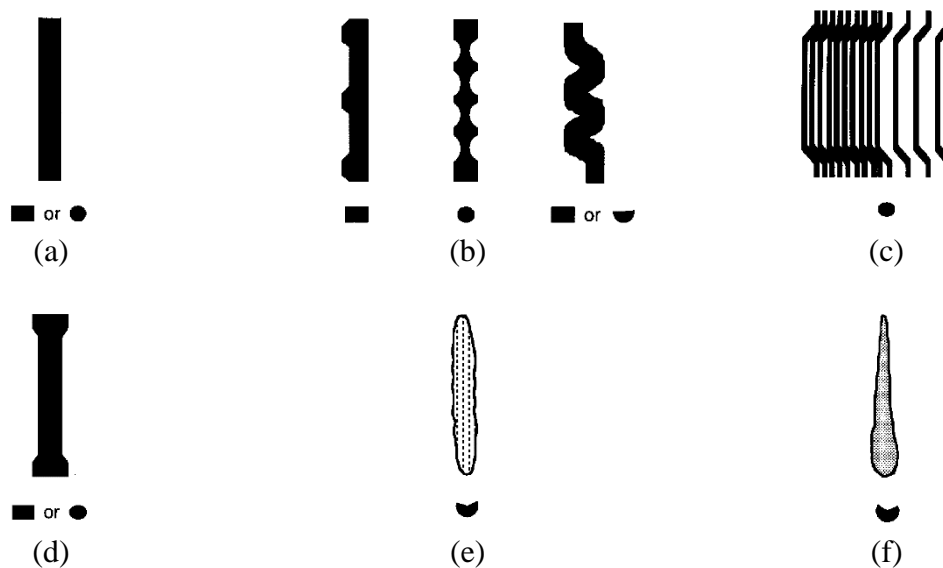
Steel fiber configurations: (a) Straight silt sheet or wire; (b) Deformed silt sheet or wire; (c) Hooked-end wire; (d) Flattened-end silt sheet or wire; (e) Machined chip; (f) Melt extract; (after ACI Committee 544, 2002)
